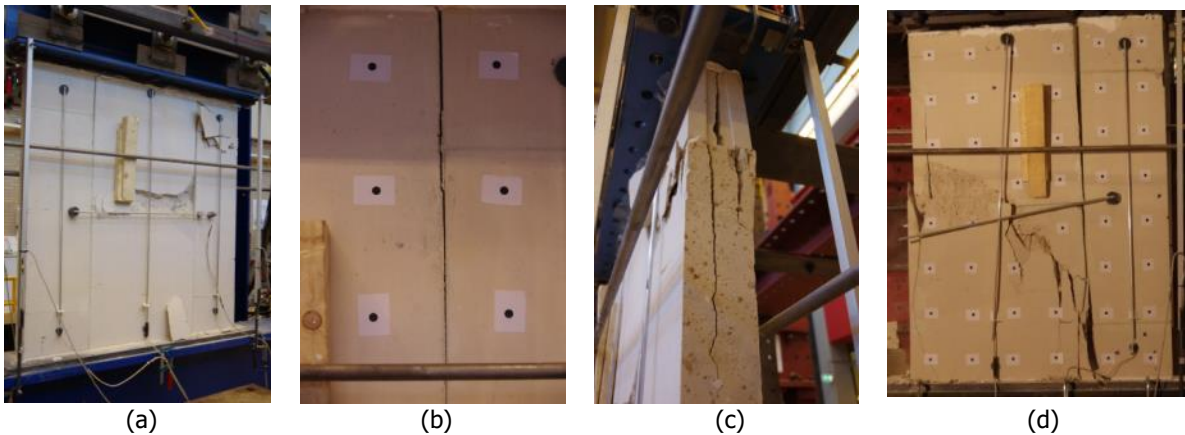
Crack pattern of specimen TUD_MAT-51j tested under horizontal compression test: (a) cracking and spalling; (b) crack formation in bed joint; (c) splitting; (d) side failure
